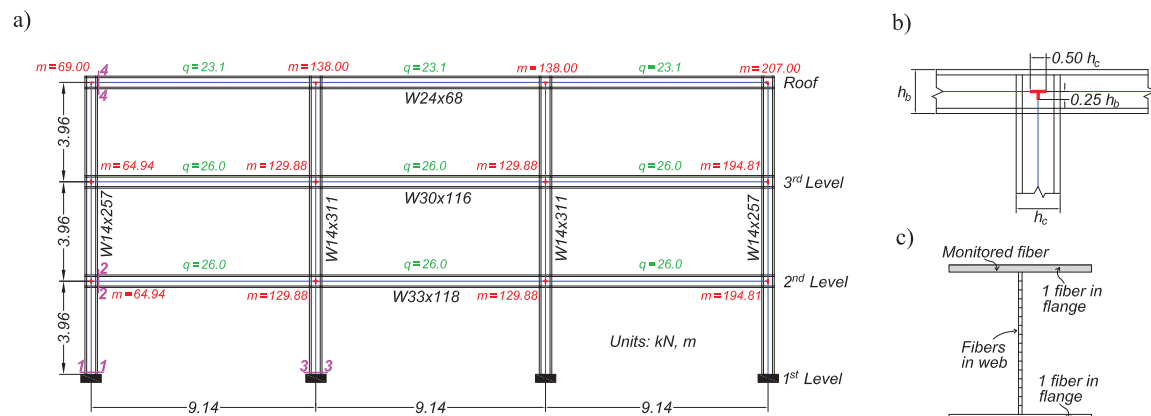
SAC-LA-3 steel building frame: (a) overall geometry, (b) rigid end zones, (c) cross-section fiber discretization.
